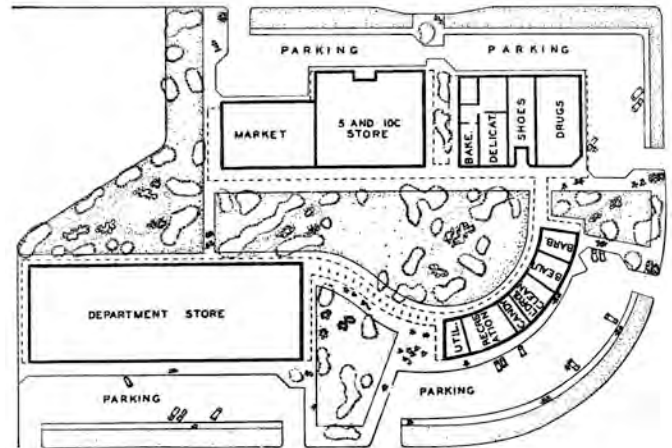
Plan for the Linda Vista Shopping Center. The Tenant Activity Building was already constructed on the parcel at the left side of the plan that is depicted as vacant.
